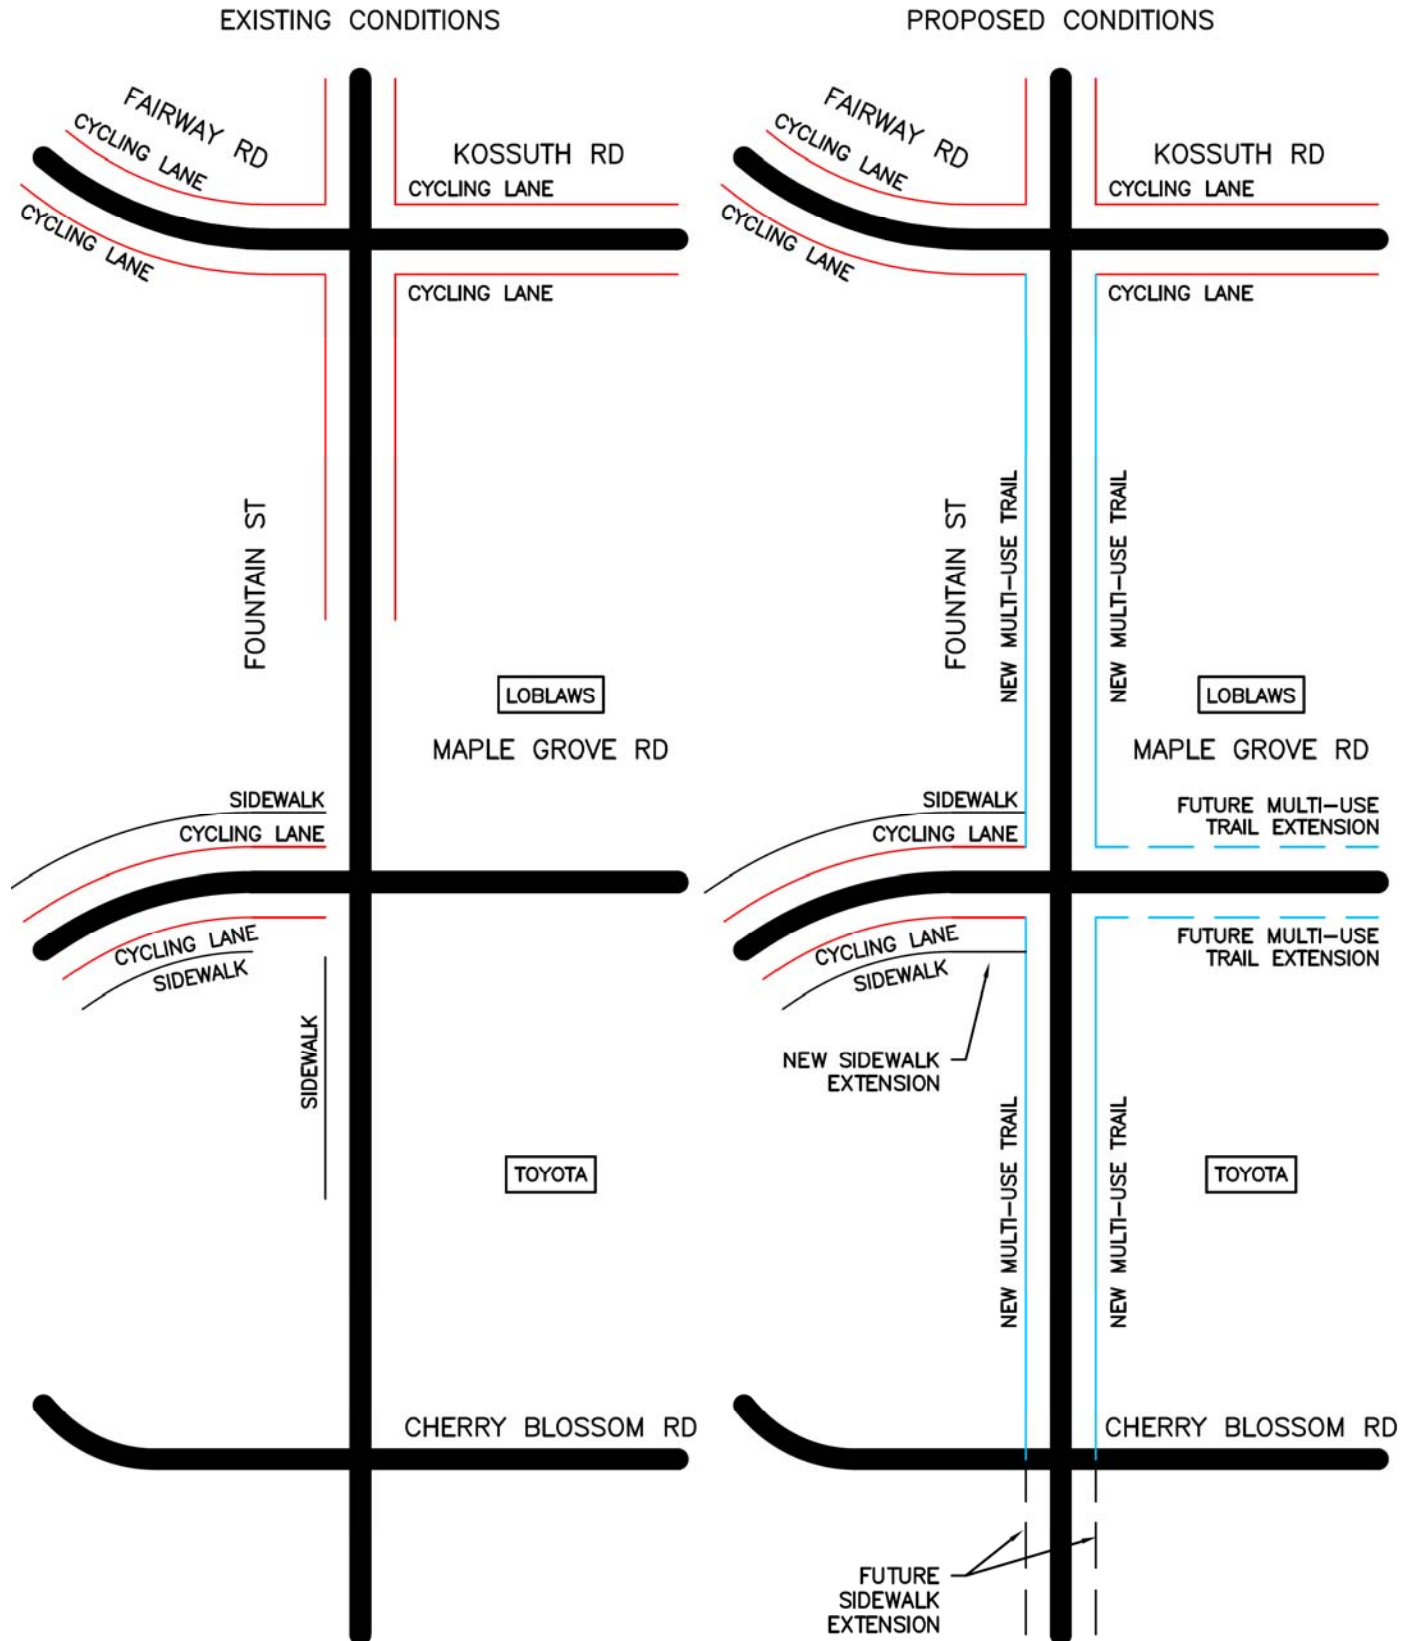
Existing and Proposed Walking and Cycling Facilities in the Fountain Street Project Area
